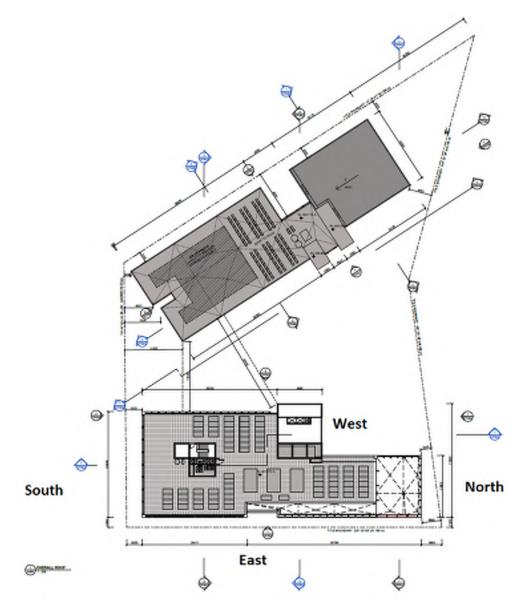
A Roof Plan showing the orientation of walls in the PHPP
